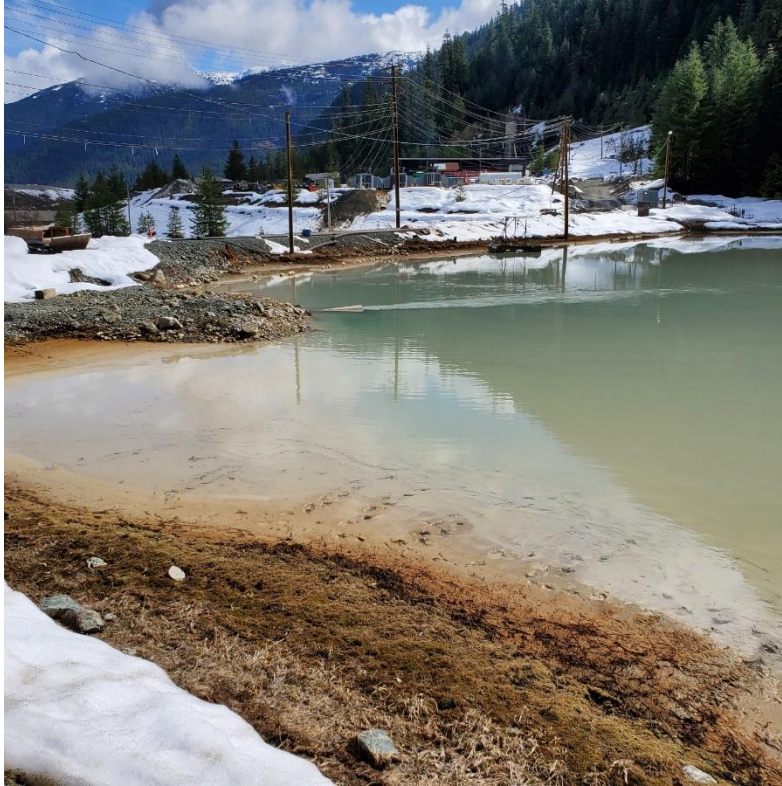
Polishing Pond 1 looking East. (March 23, 2022)
